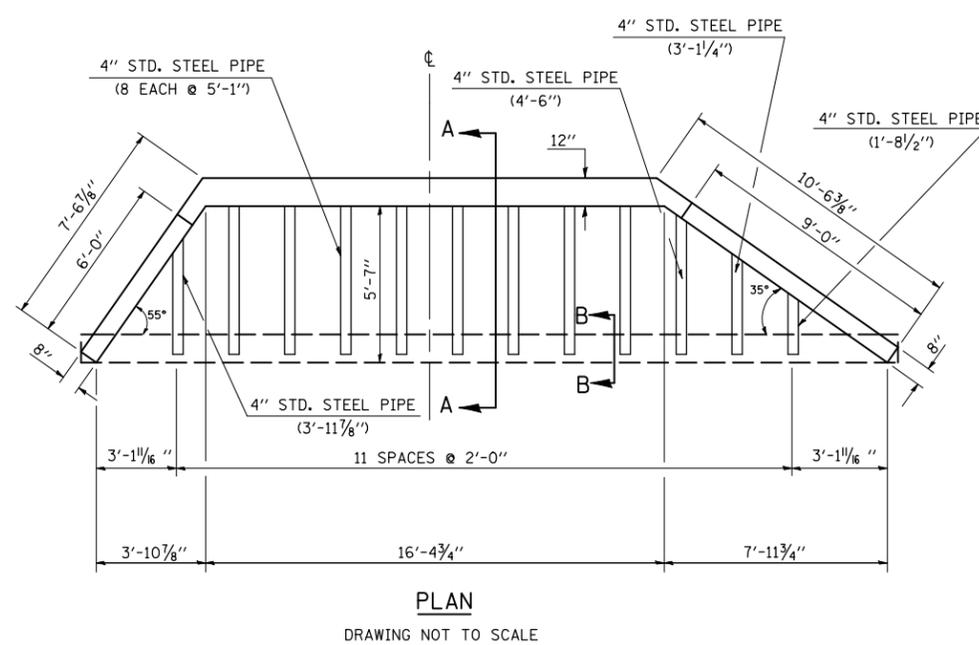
DETAIL OF GRATING FOR CONCRETE HEADWALL CULVERT NO. 6, STATION 2030+82.00 S.N. 010-8143
